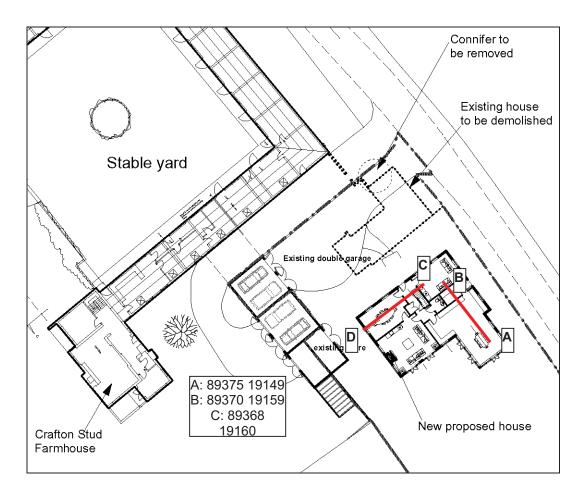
Garden Cottage proposed development with trench locations (scale 1:500)
